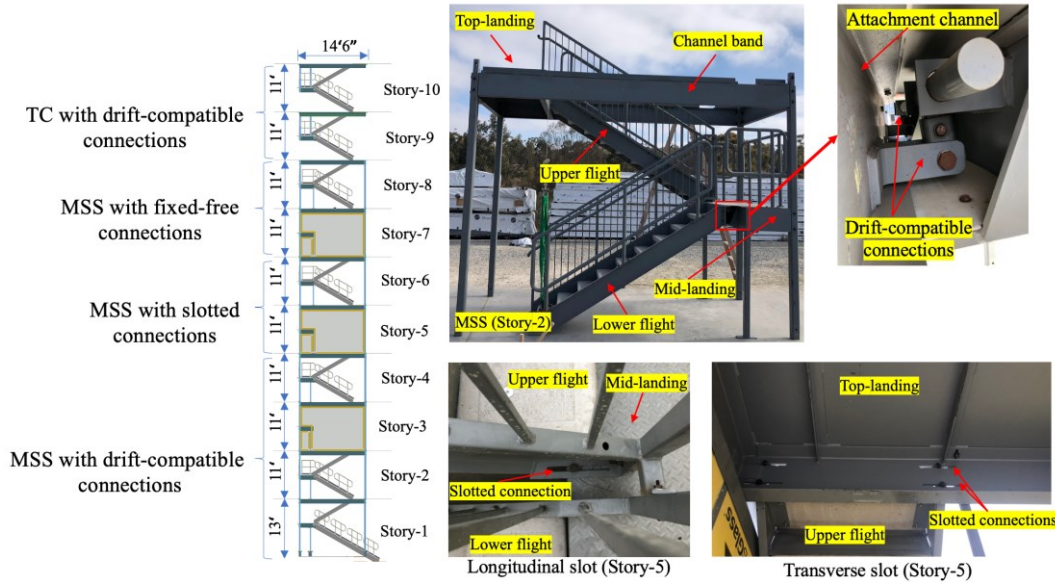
10-story stair tower (Left), and a sample of stair connection details (Right)
